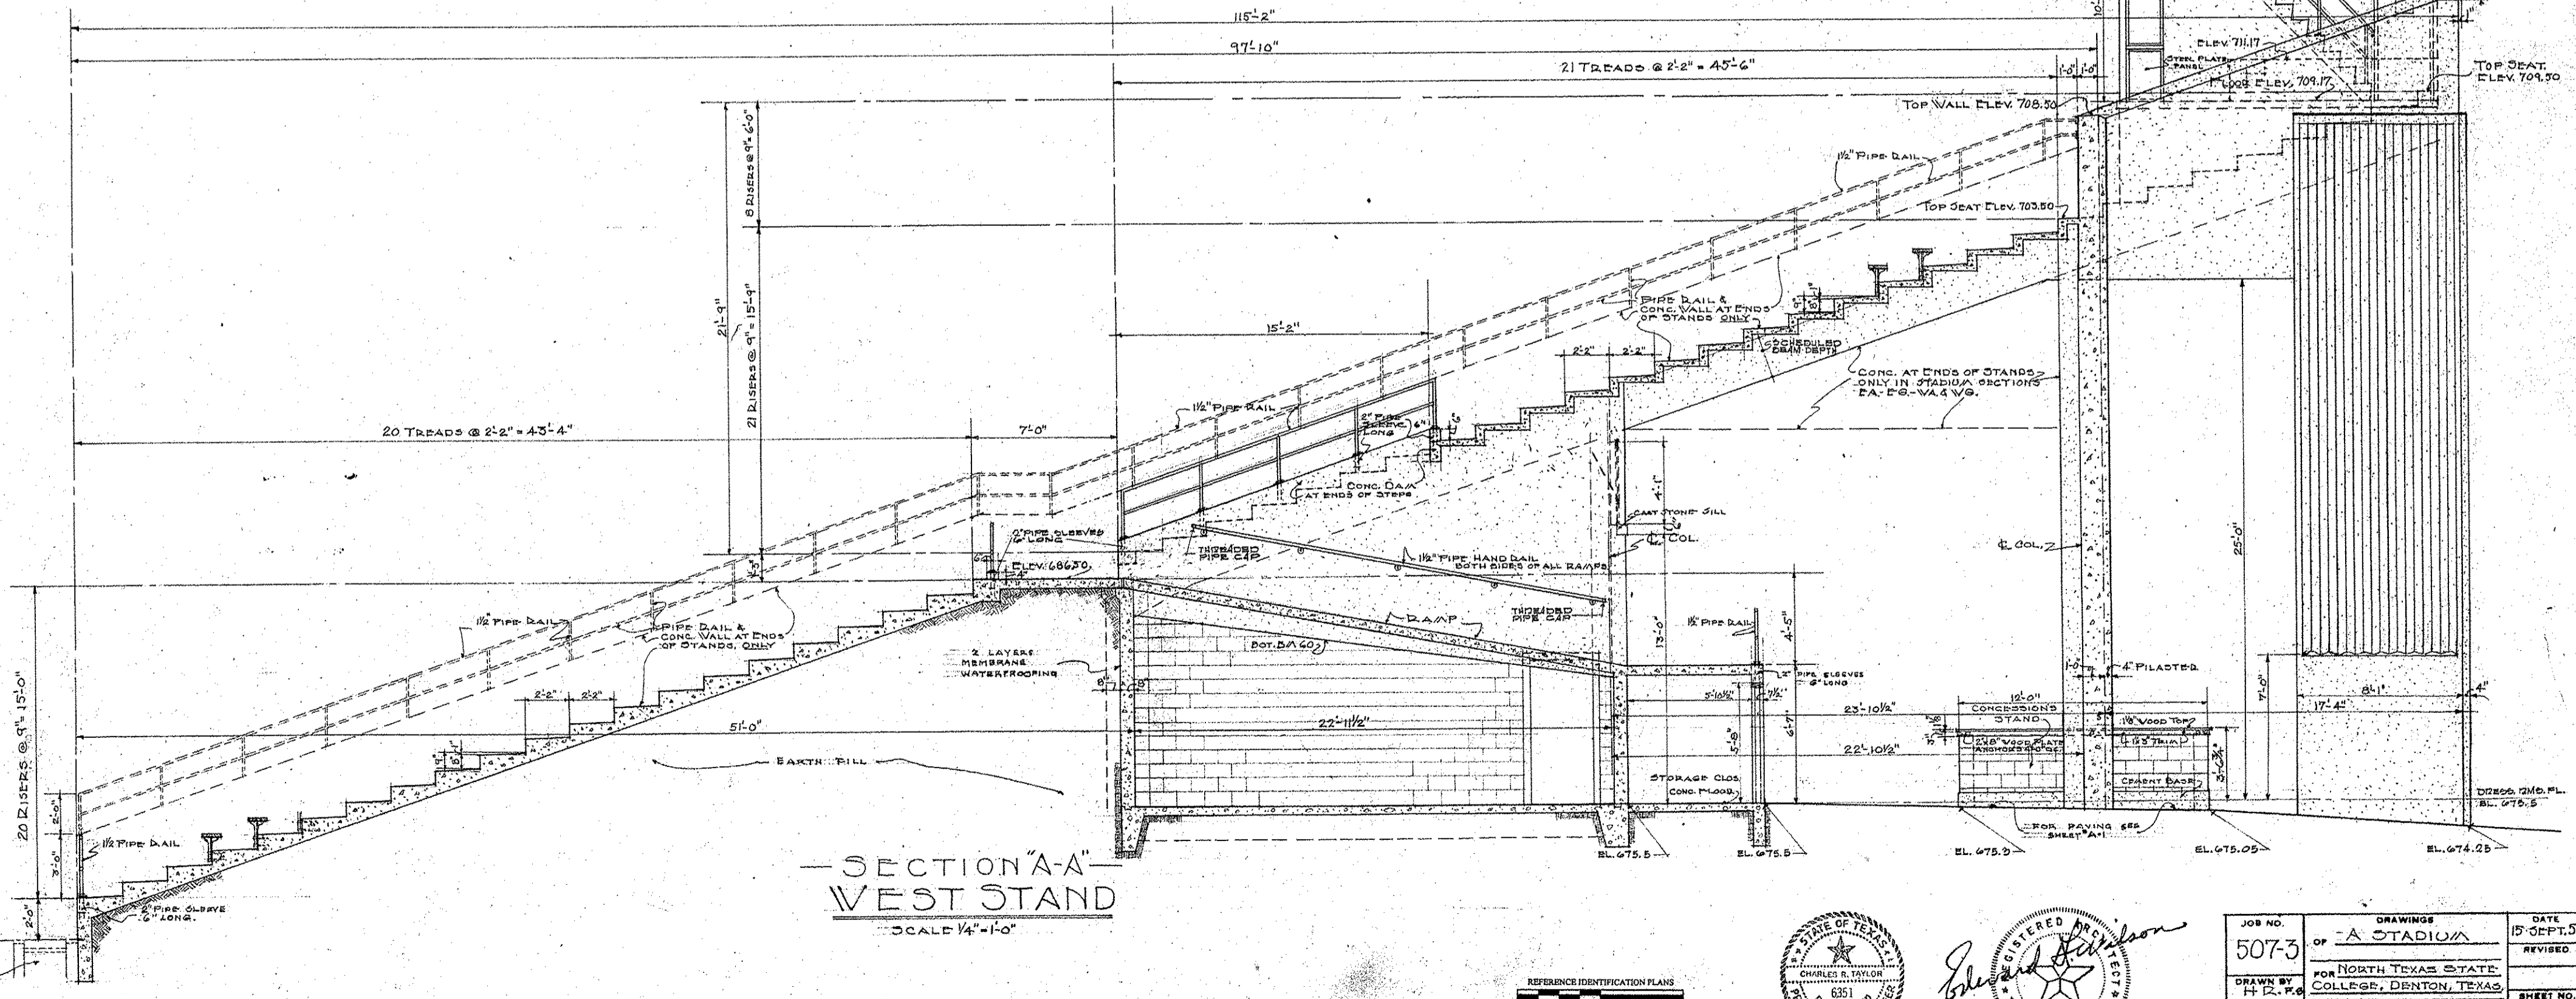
DETAIL OF ELEVATION AT STADIUM SECTION WE' & WD'
